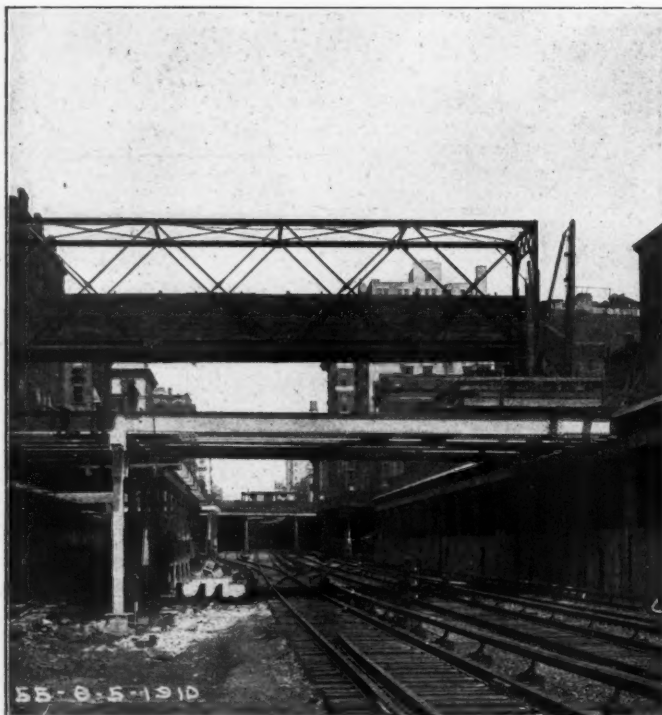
Fifty-fourth Street Bridge; Looking North. Entrance to Park Avenue Tunnel.
